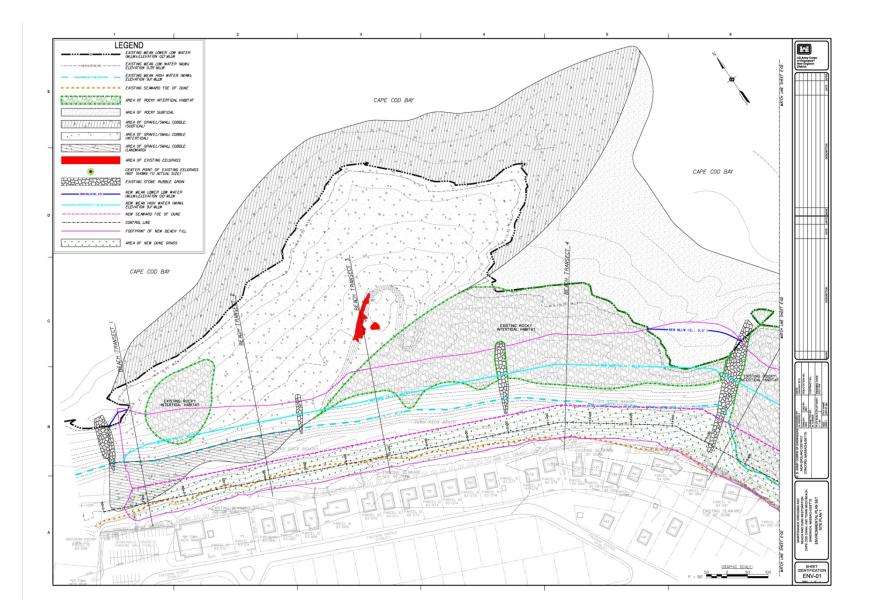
A. Plan of western half proposed placement on Town Neck Beach, Sandwich, MA, with resources mapped.
